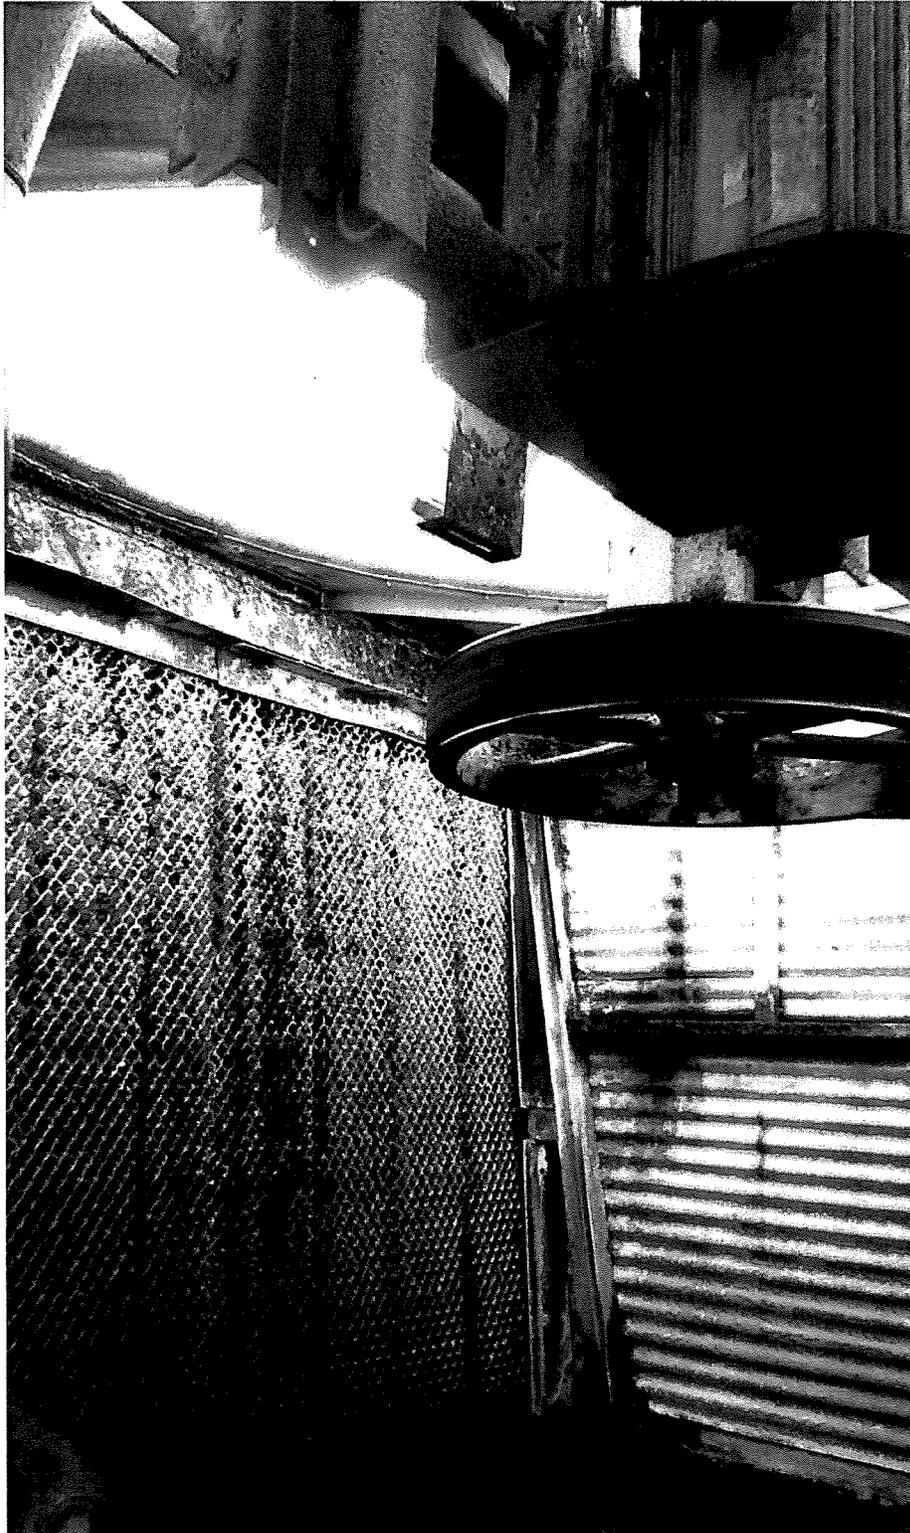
Typical interior of cooling tower. Fan is overhead in photo. Corrugated side panels are FRP.
